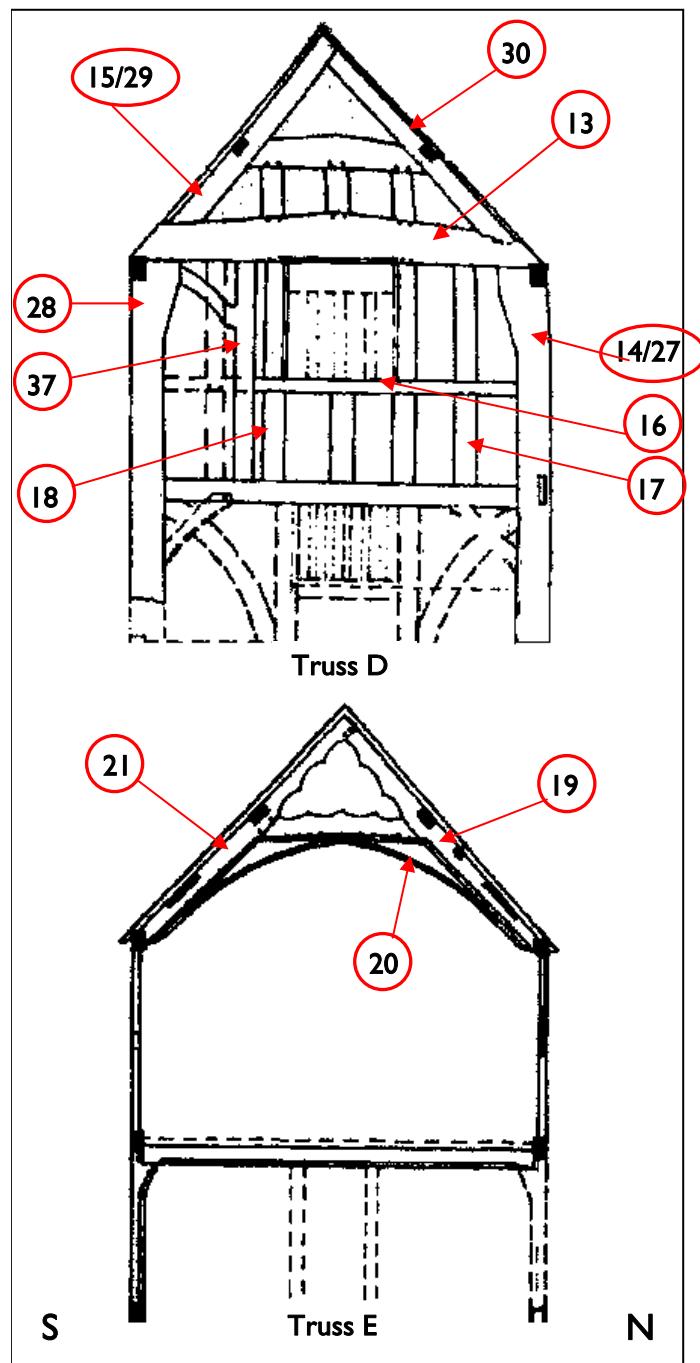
North cross-wing trusses (solar) to show timbers sampled (after Jones 1975–76)
